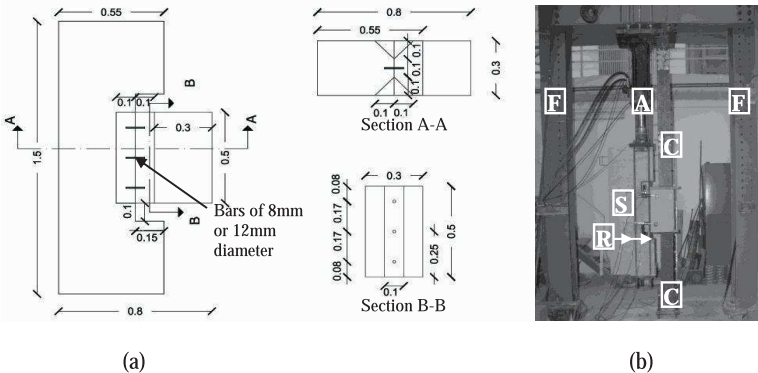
Tests at NTUA: (a) Geometry of the specimens with three bars crossing the interface (dimensions in metres), (b) Photo of the test set up, with specimen in the testing position
